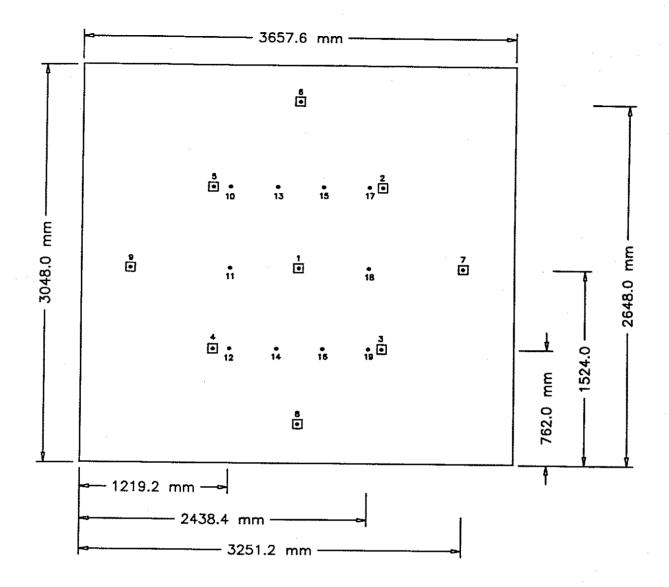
Screw Locations For Steel Stud, 2x2 Gypsum Board Layers, Full-Scale Assembly, Face Layer Gypsum Board, Fire Exposed Face
